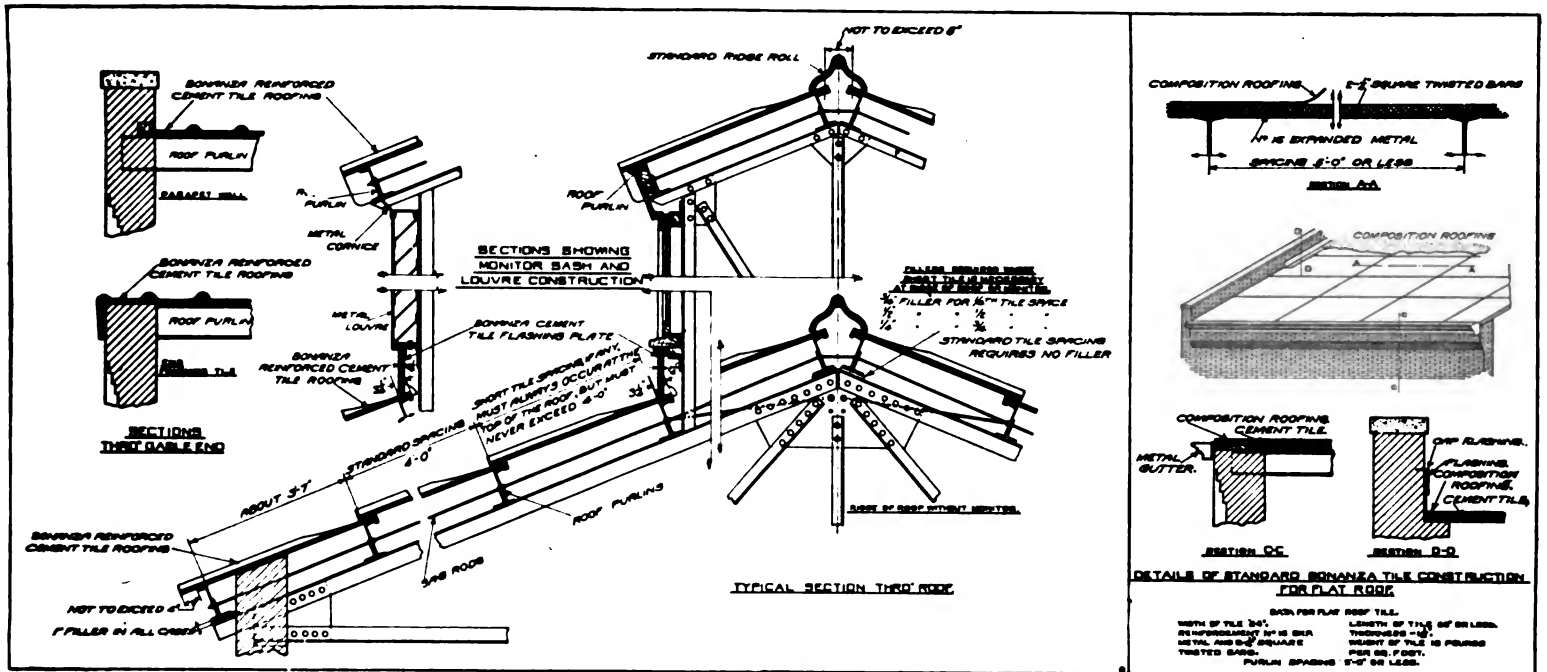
SECTIONAL DETAILS OF STANDARD "BONANZA" CEMENT-TILE CONSTRUCTION
